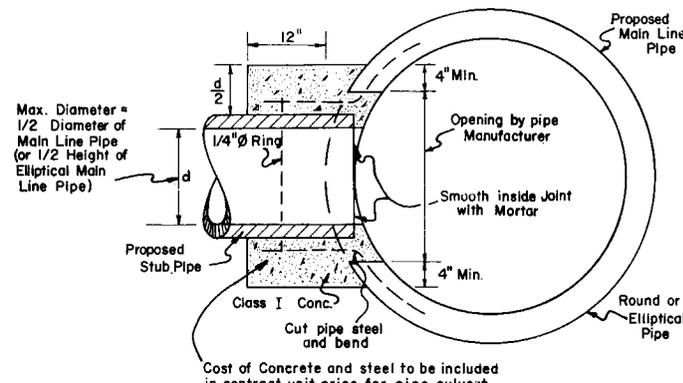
DETAIL OF CONCRETE COLLAR FOR ELLIPTICAL CONCRETE PIPE JOINTS
